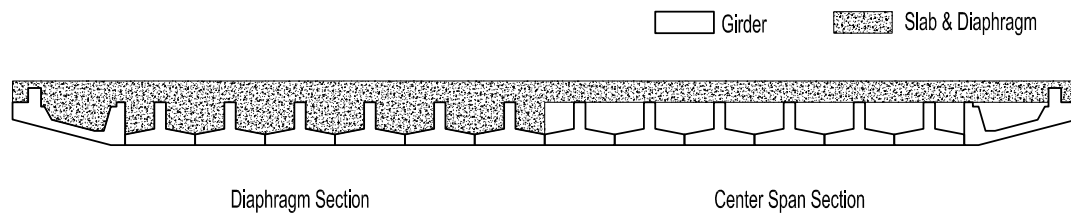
Cross-section view of the bridge illustrating both with and without diaphragm.
